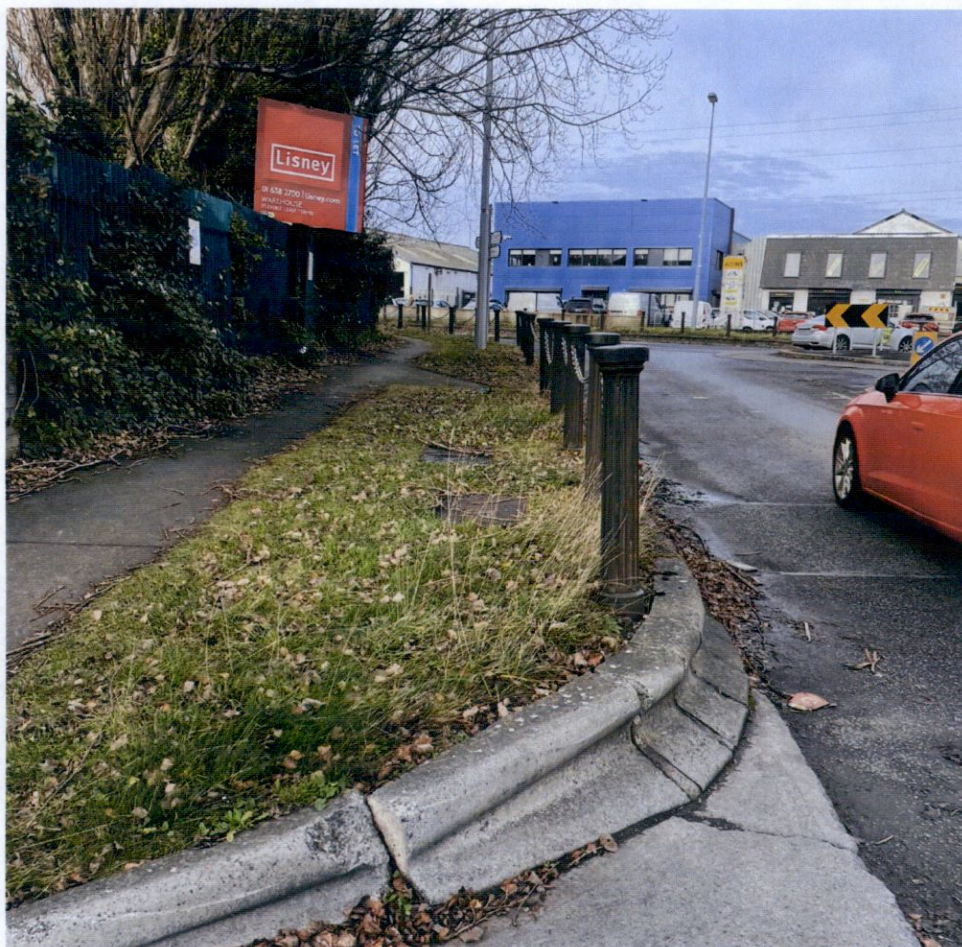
Existing Condition of Public Realm (east of the site on Cookstown Road)
